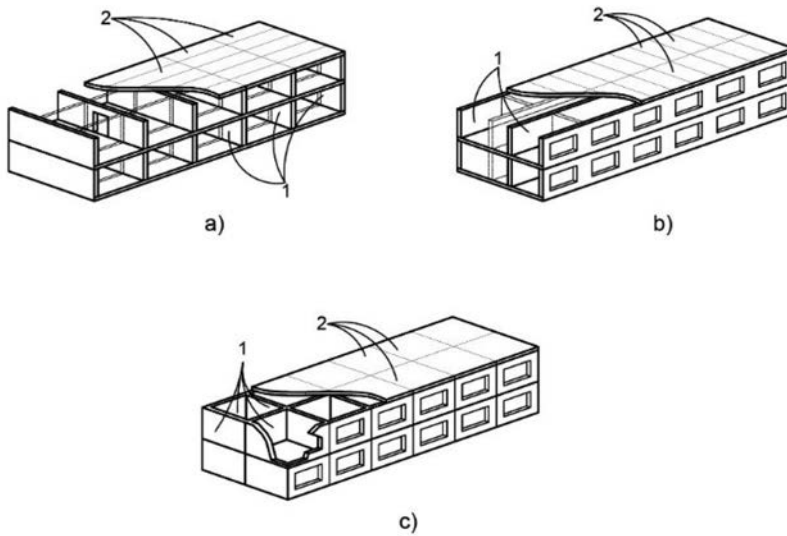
Basic structural configurations for LPE buildings: a) cross-wall system; b) long-wall system, and c) two-way system (note: 1- wall panel and 2- floor panel) (based on FIB 2008).
